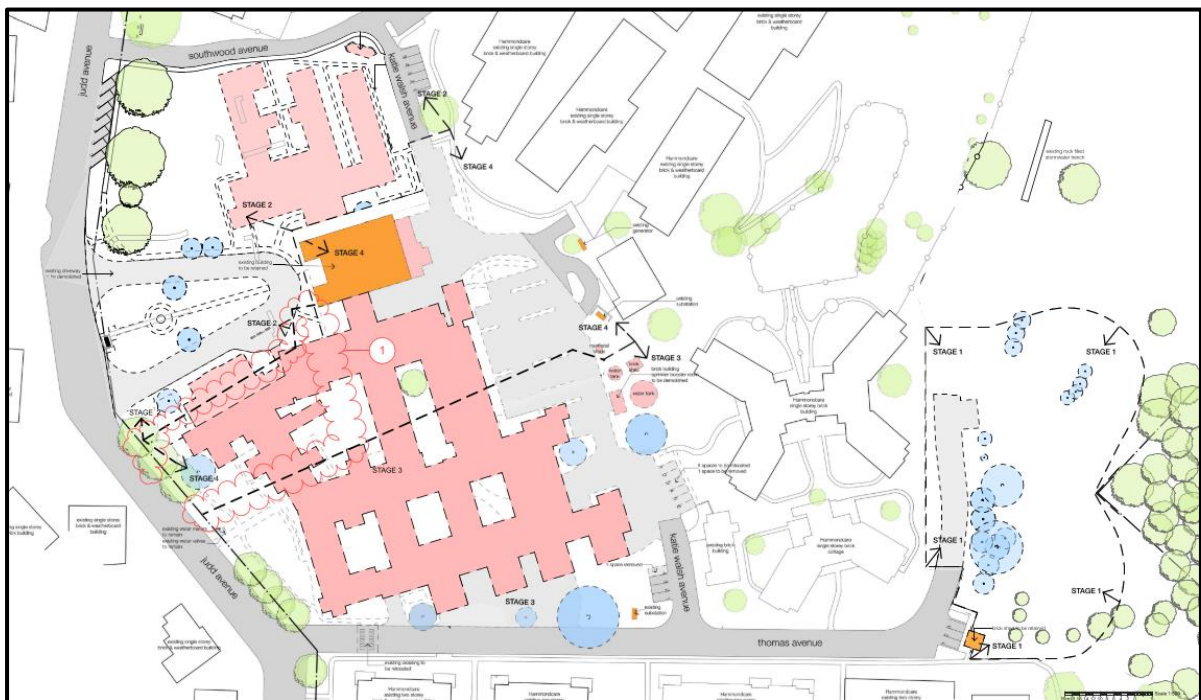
Proposed Staging/Demolition Plan for Subject Modification C
